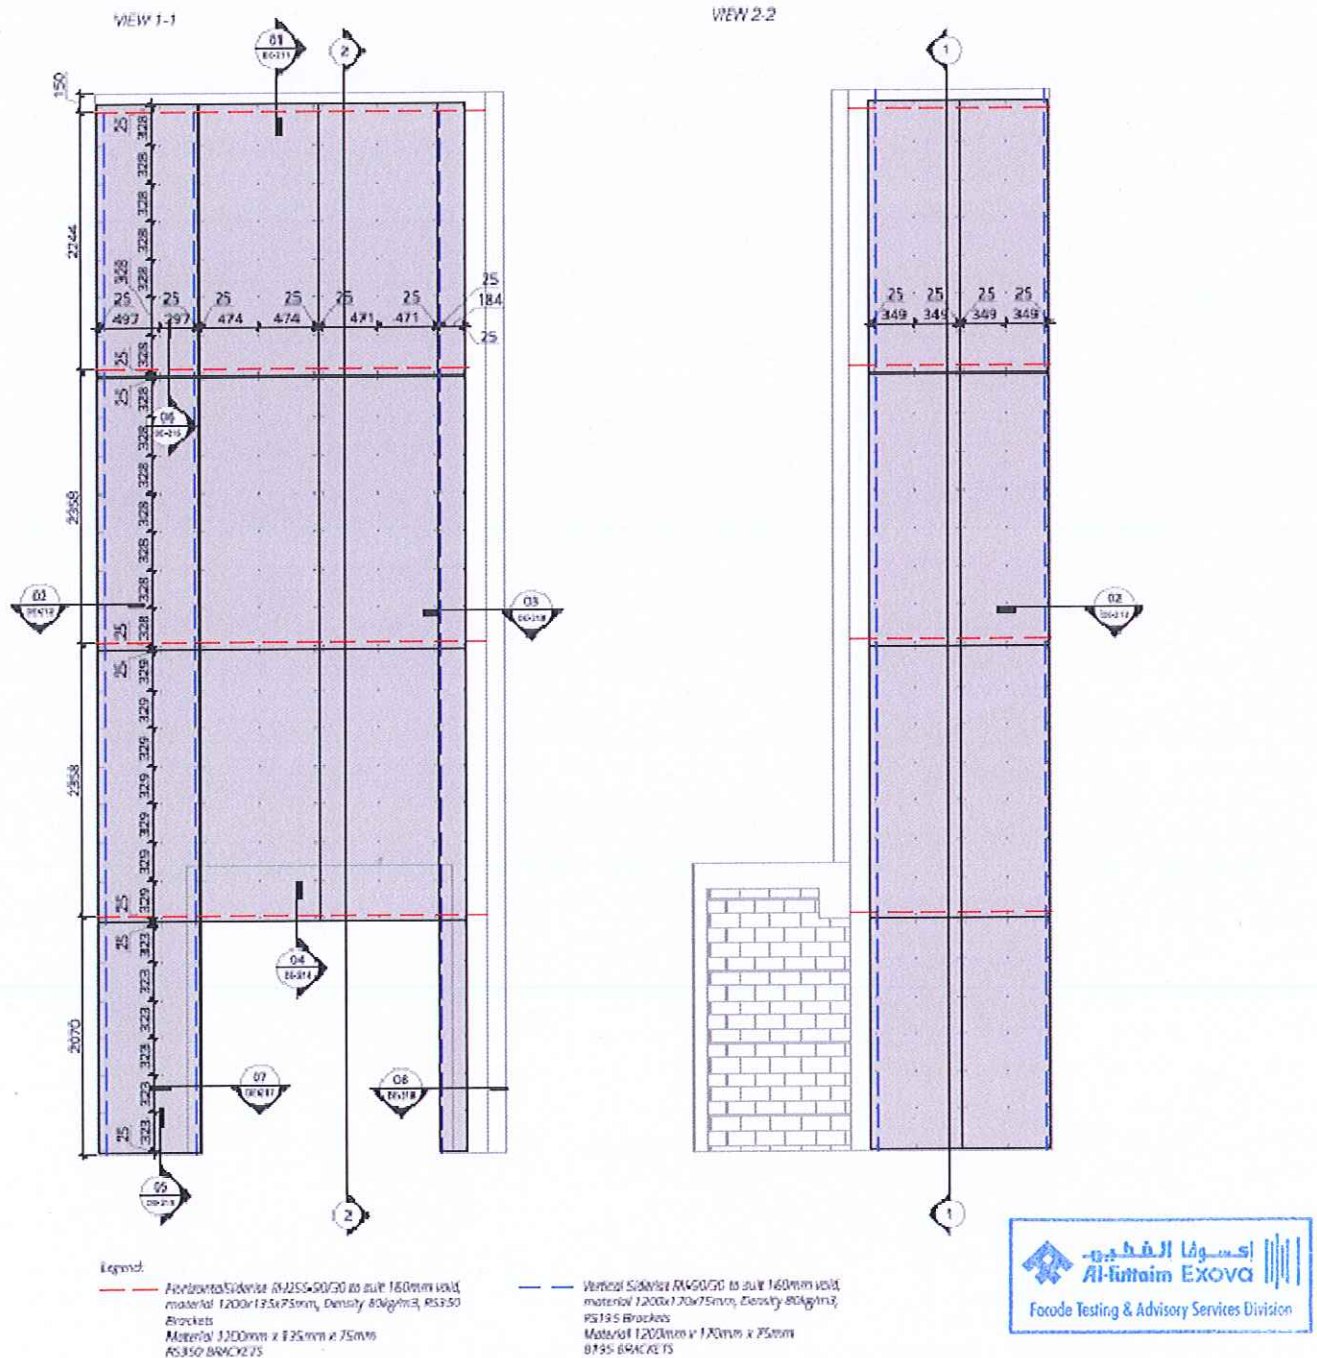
Tested sample elevation showing cladding panel and cavity barrier layouts
